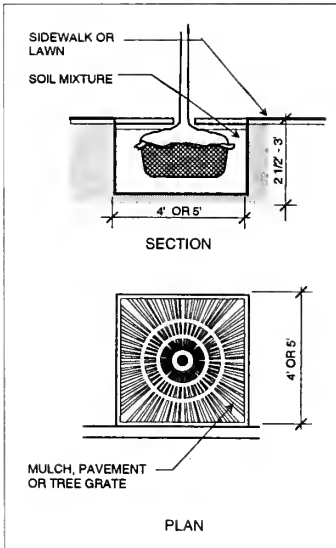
Figure A. Standard tree planting detail. Conventional planting technique showing typical tree pit used for planting street trees containing about fifty cubic feet of prepared soil. This detail is effective in suburban areas where there is good growing soil surrounding the planting pit, but not in most dense urban areas.
